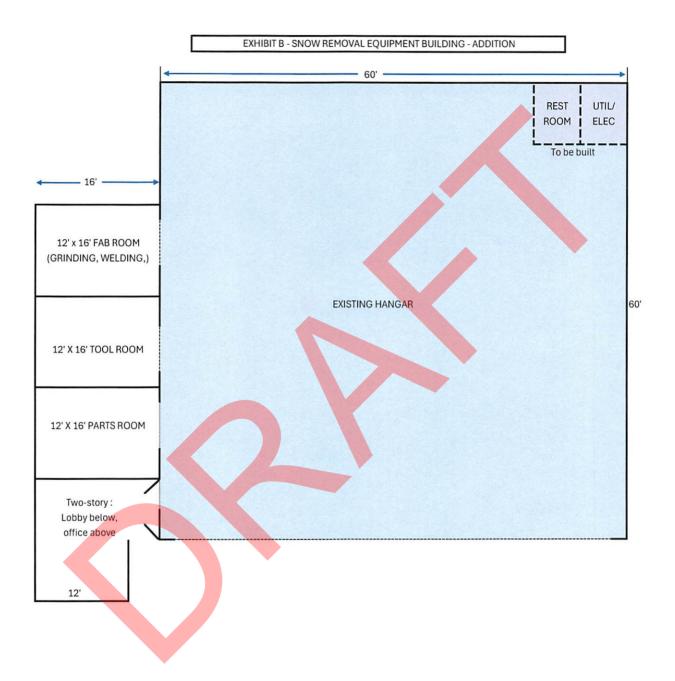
EXHIBIT A - SRE BUILDING ADDITION AND REMODEL PROJECT
